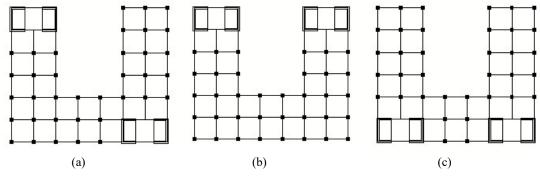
Building Plan Configuration With Shear Wall (a) V1, (b) V2, and (c) V3
